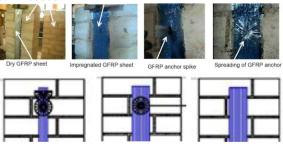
Installation of GFRP sheets and GFRP anchor spikes using different configurations^{1,2,3,4}.
